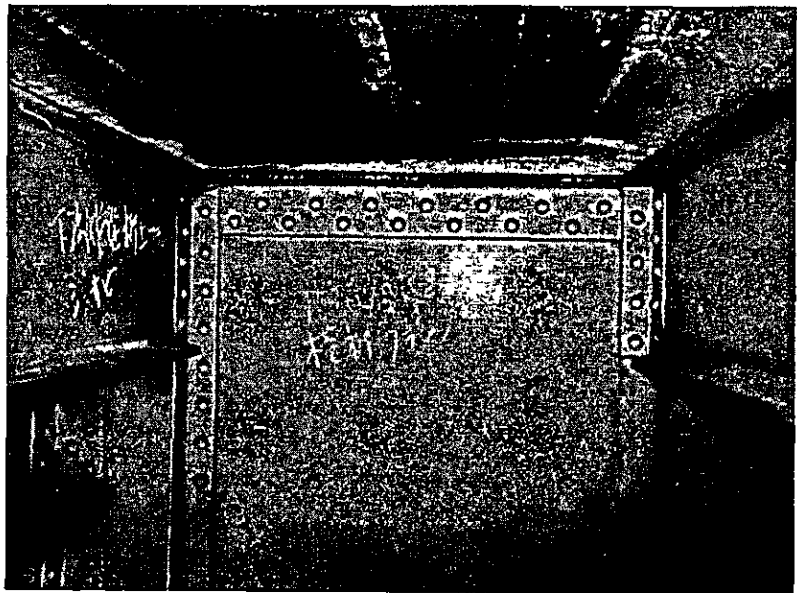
Rusting of Stringers and Cross Beam under the Construction Joint of the RC Floor Slabs
